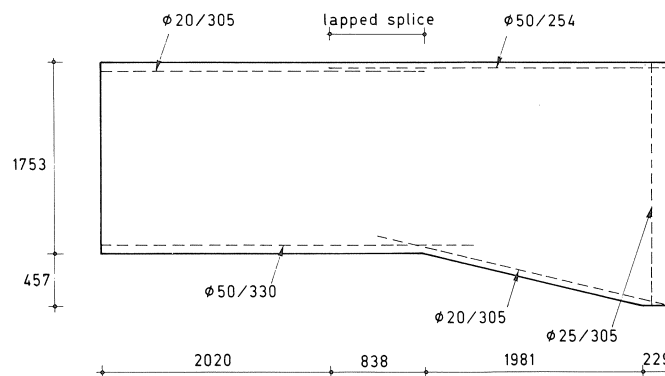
Detail of cross-section for nonlinear analysis. Dimensions in mm. Reinforcement  $\varnothing 20/305$  means 20 mm diameter reinforcing bars, 305 mm centre-to-centre.
